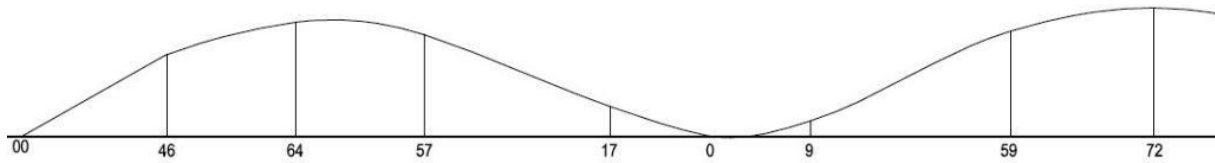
Camber in the steel section to compensate for the steel girder deflection from concrete (see Appendix A).
